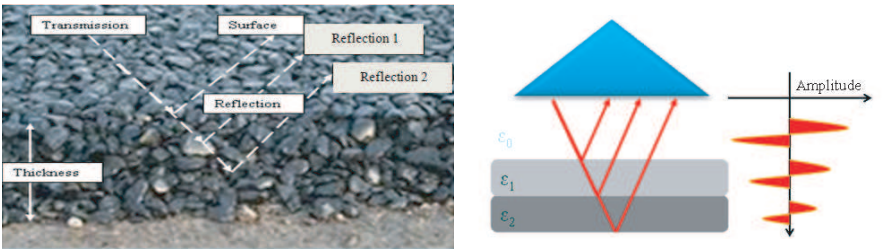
Typical GPR reflections from a road pavement slab in mixture model.
